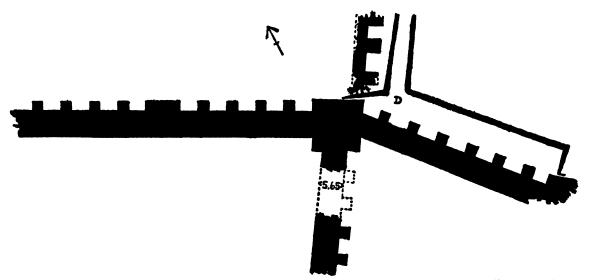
Mirgissa, Plateau Fort. Plan of north-east corner of inner wall, outer wall arbitrarily restored (top right), ditch (D), spur to cliff-edge (extreme right). Adapted from Kush 8, plan 4.
